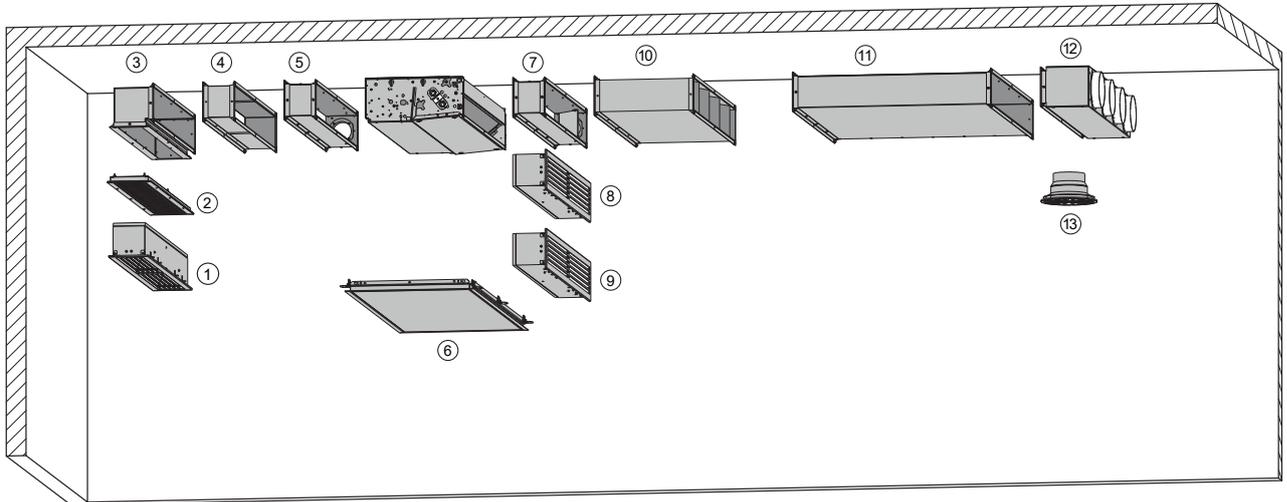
Diagram of arrangement of sheet steel accessories for ceiling-mounted units
